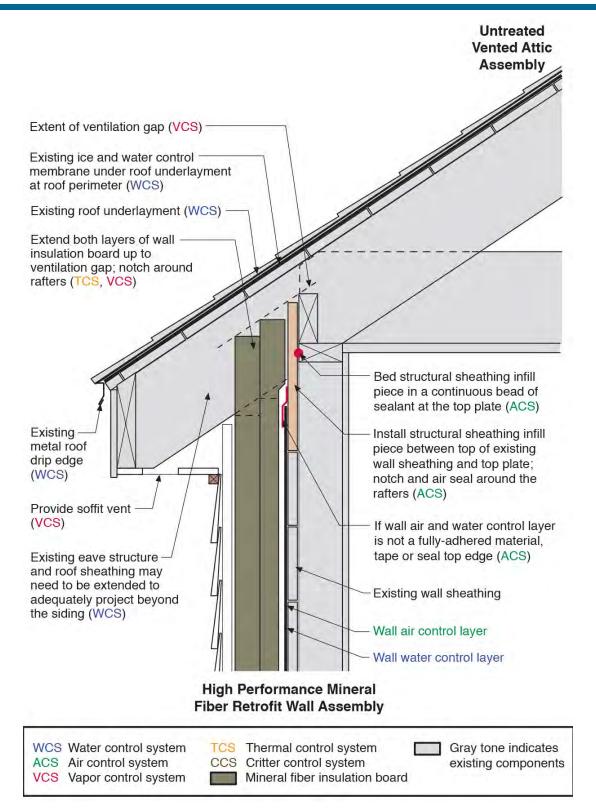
Schematic detail for eave transition from a high performance mineral fiber retrofit wall assembly to a non-retrofit roof assembly
